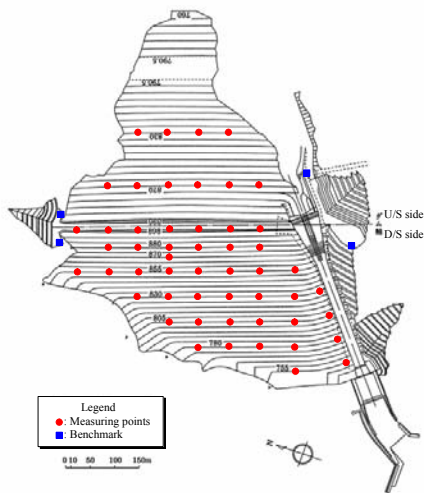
Layout of exterior deformation measurement use targets on a rockfill dam (Naramata Dam)
